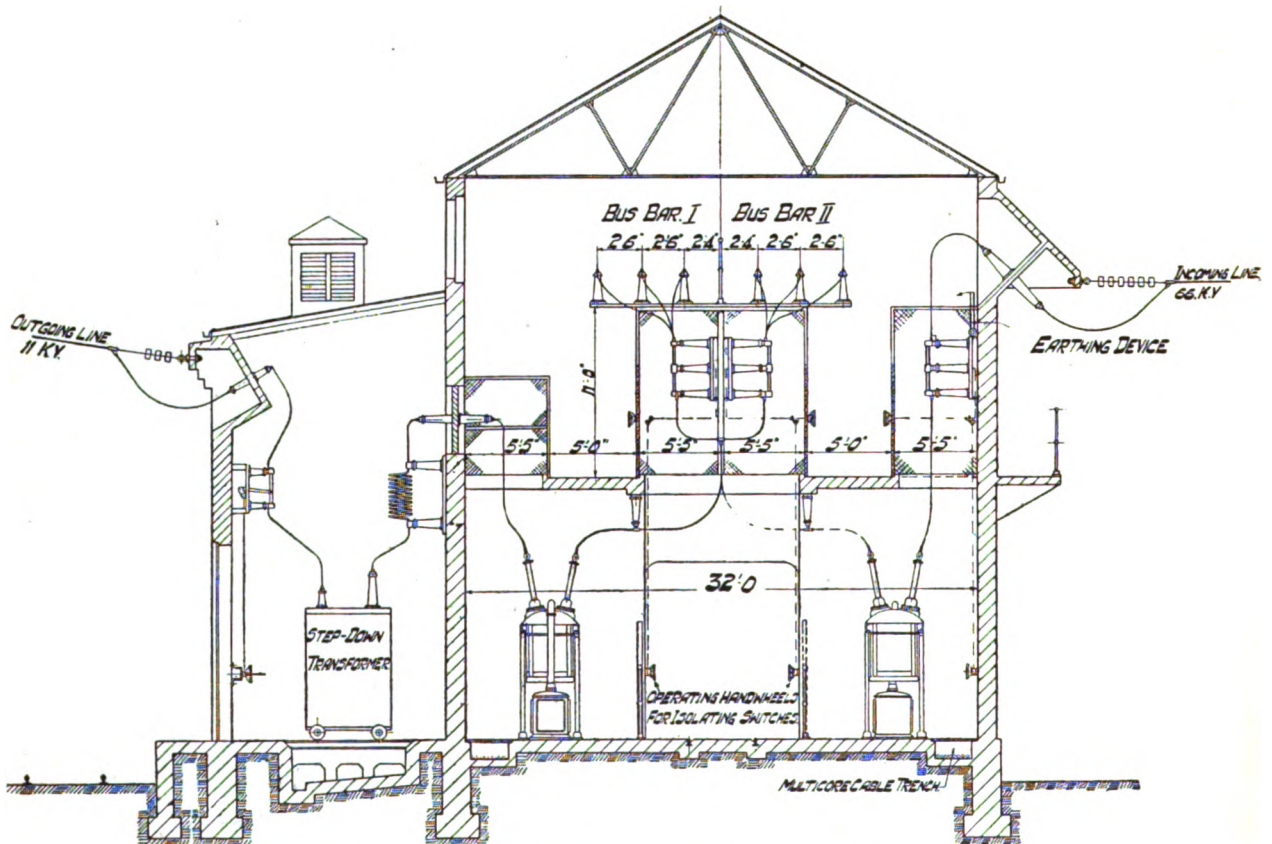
Layout of 66-kV indoor station. Sectional elevation.
